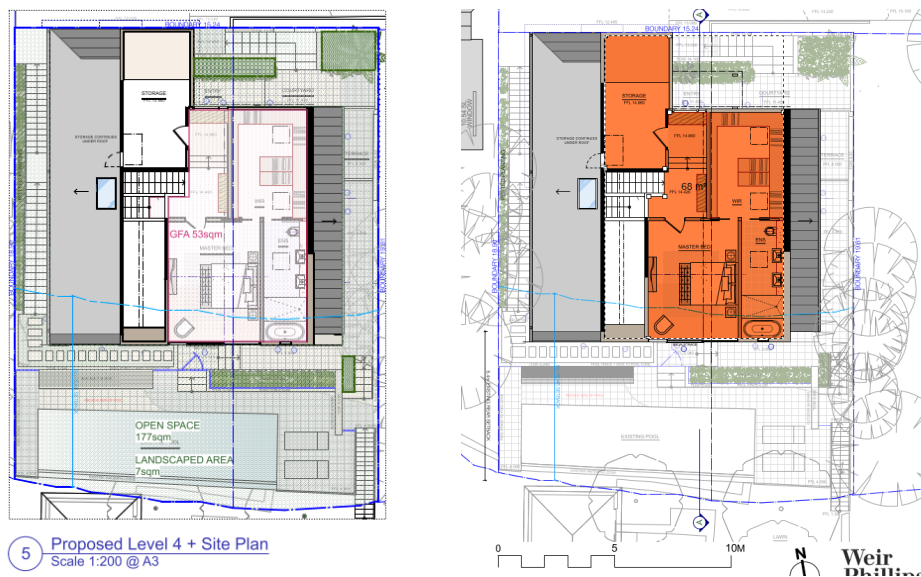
Left image showing how L4 Floor space was calculated (excluding storage) upon the issue A Plan (53sqm). Right image showing L4 Floor Space calculated including storage area upon the Issue A Plan (68sqm).
